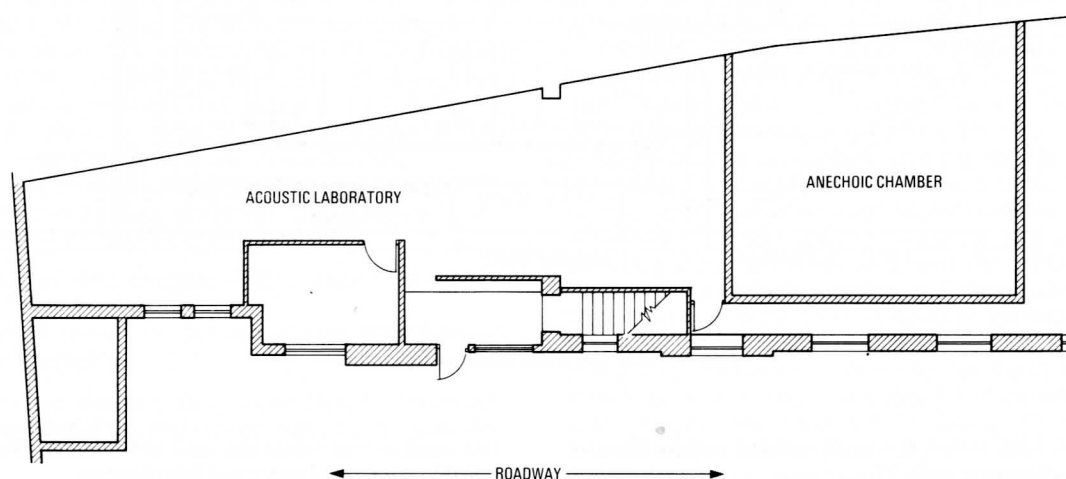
Outline plan of anechoic chamber and acoustic laboratory
